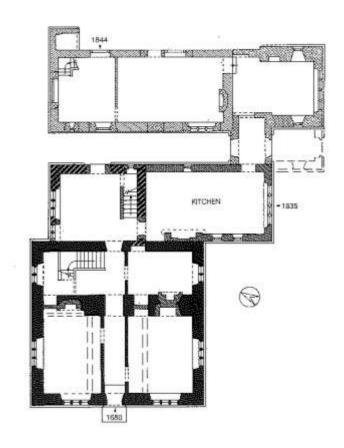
Historical Plan Progression, Houses of the North York Moors, HMSO 1987, pg. 37 Fig. 43
